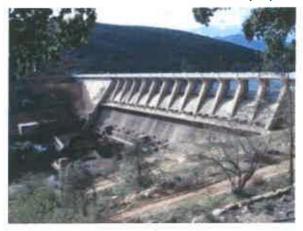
View of existing Clanwilliam Dam Wall from western bank
